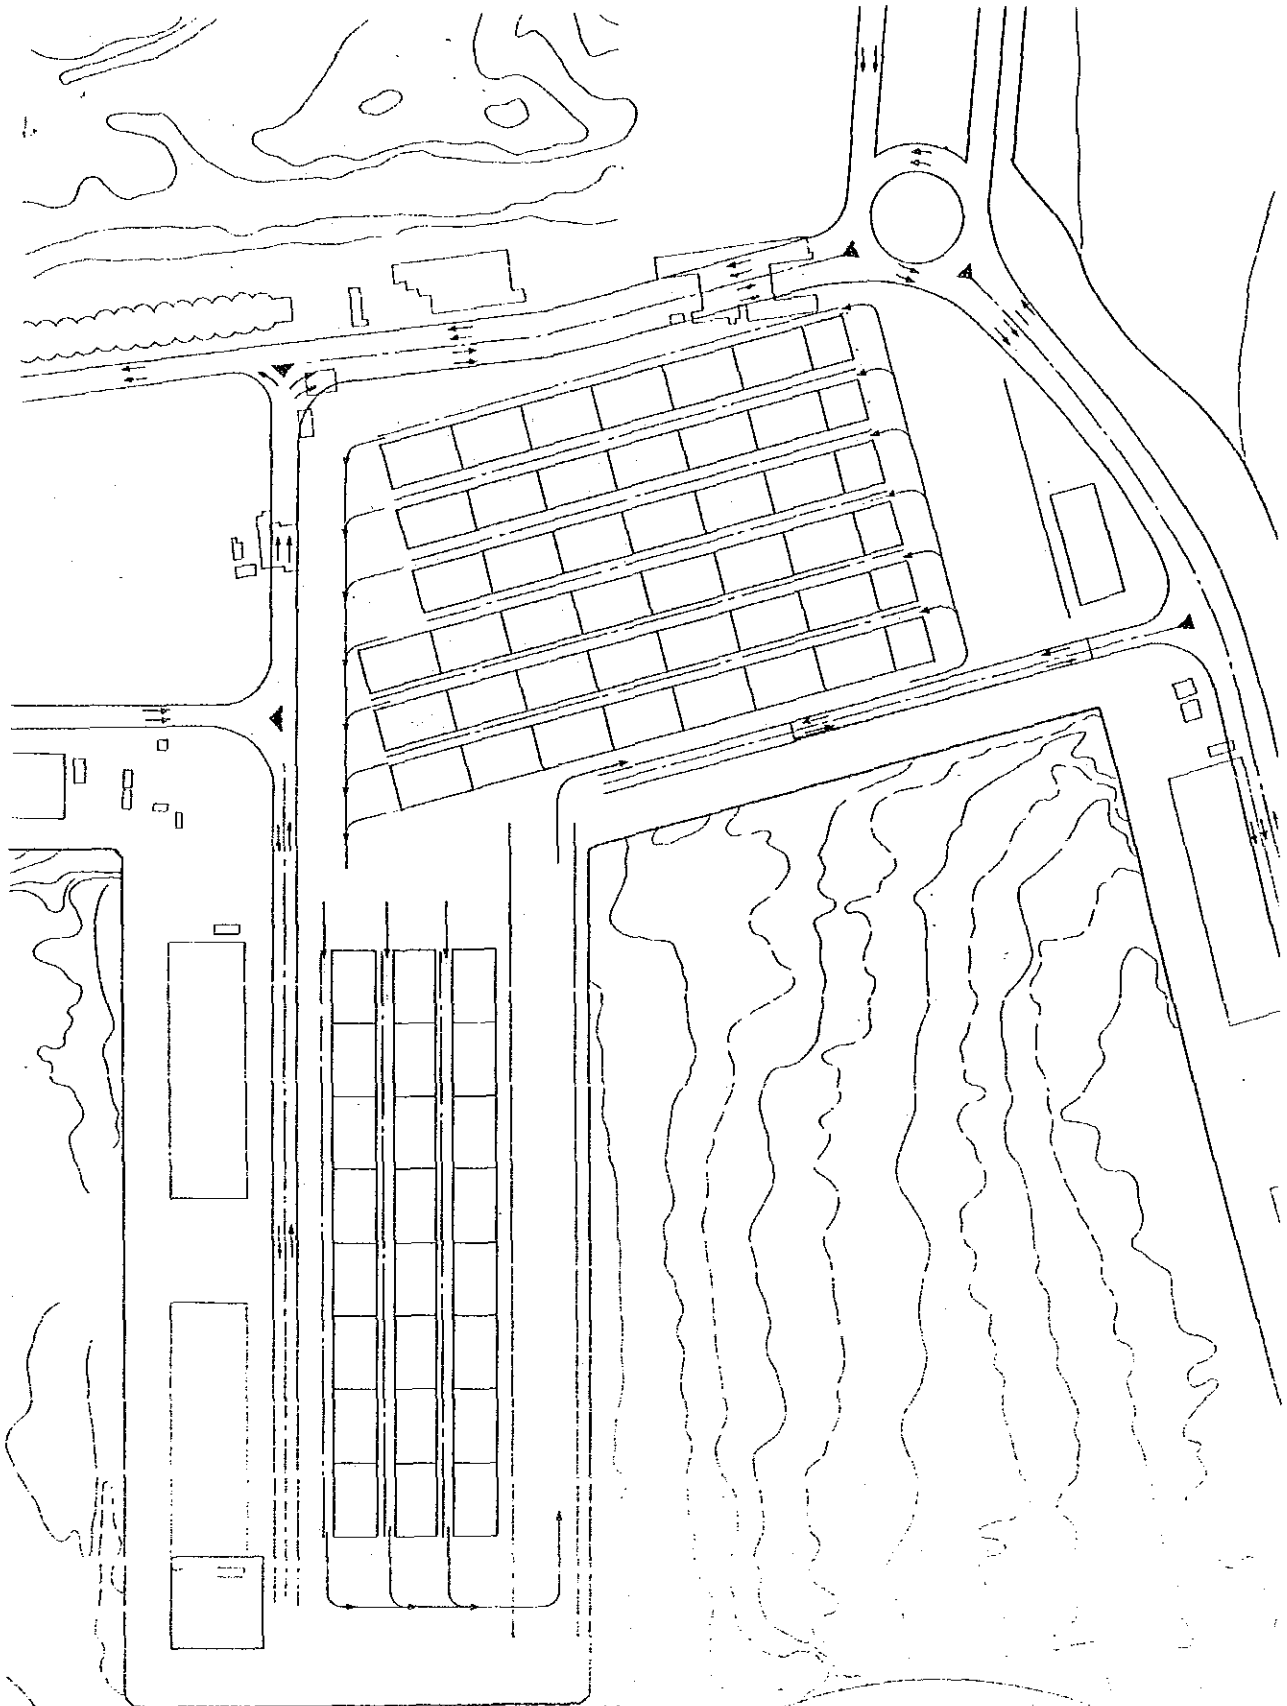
(a) Container Berth Layout Alternatives (Plan A)
